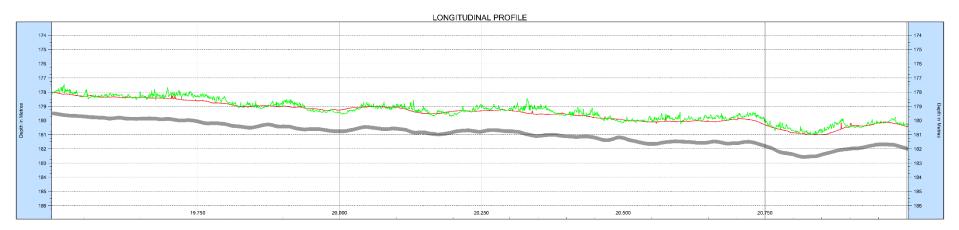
PL4556 As-built alignment sheet KP19.493 to KP21.003
